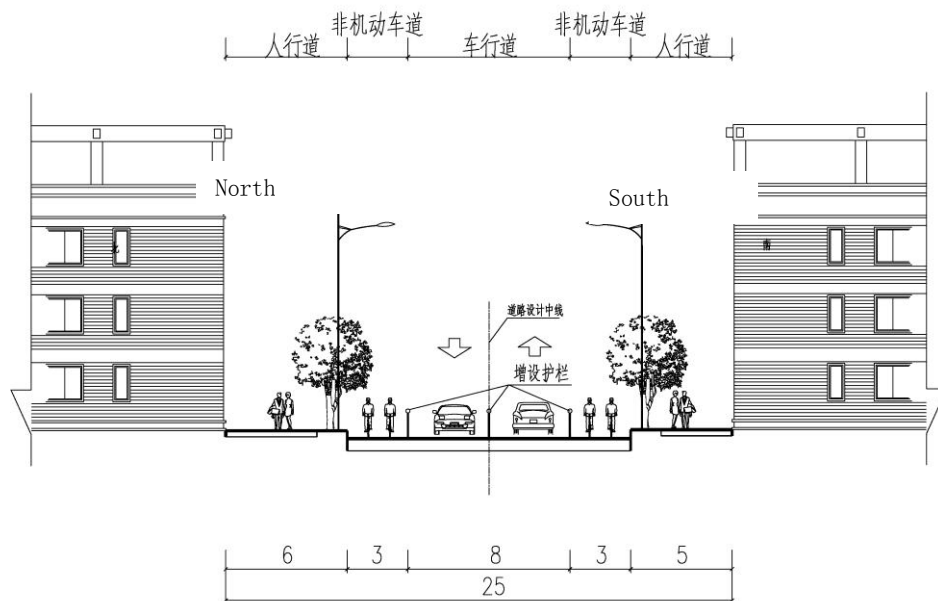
Sectional View for Reconstruction of Biyun Road (Wenchang Road ~ Hankou-Danjiangkou Railway)
